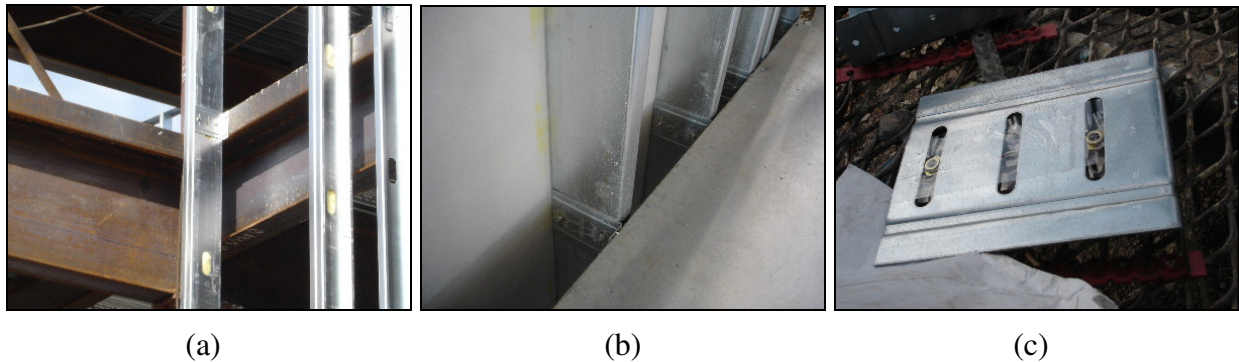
VTK2 Exterior Wall Framing Attached to Tested Floor and Vertical Clip
